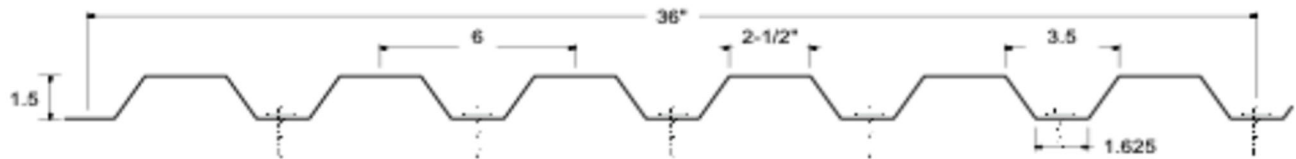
12 TMP LITE WALL 1.5-6-36 PANELS (6 SCREWS)
